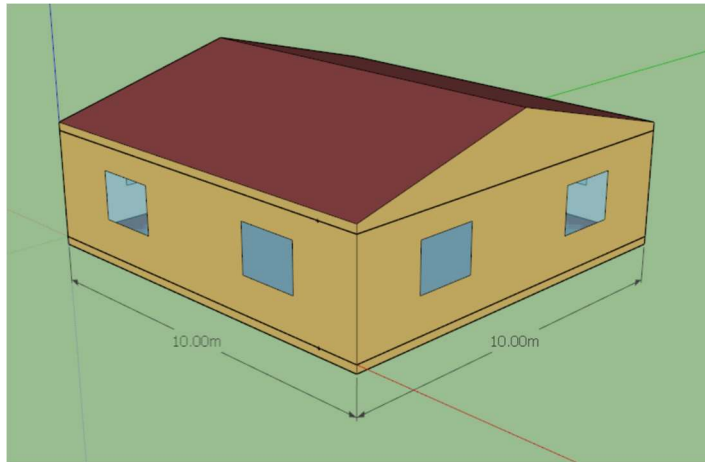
Single-dwelling building (from 1961 to 1990) [18]
